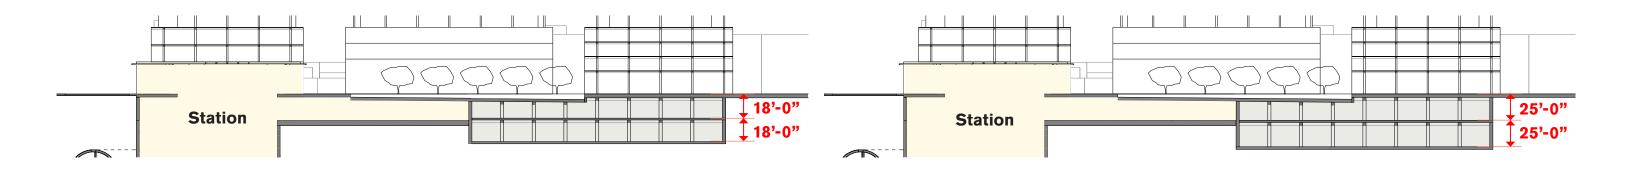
Alt. Floor to Floor : 18' - Double Car Stackers
